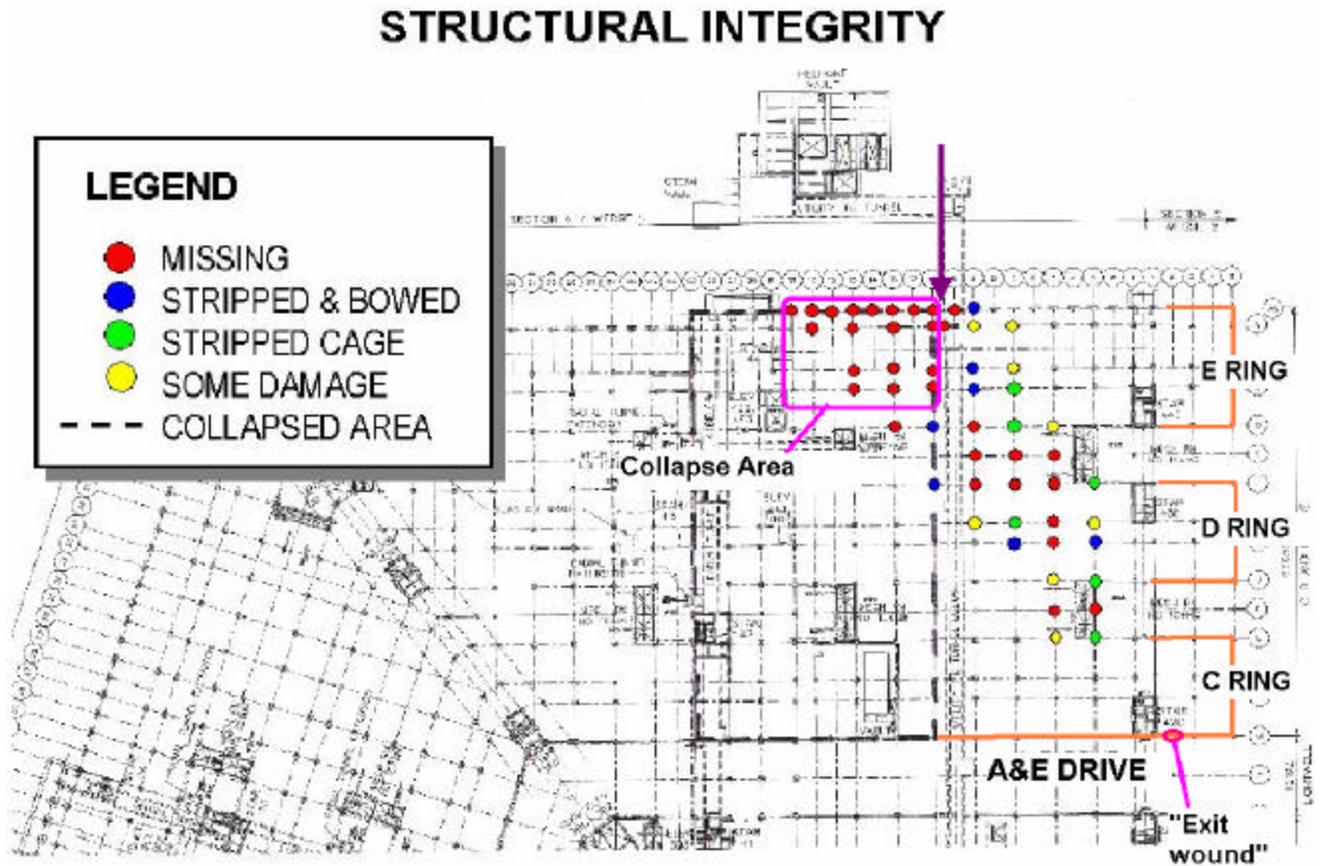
Structural Integrity Plan. Indicates missing and damaged columns. (Tills, 2001)
